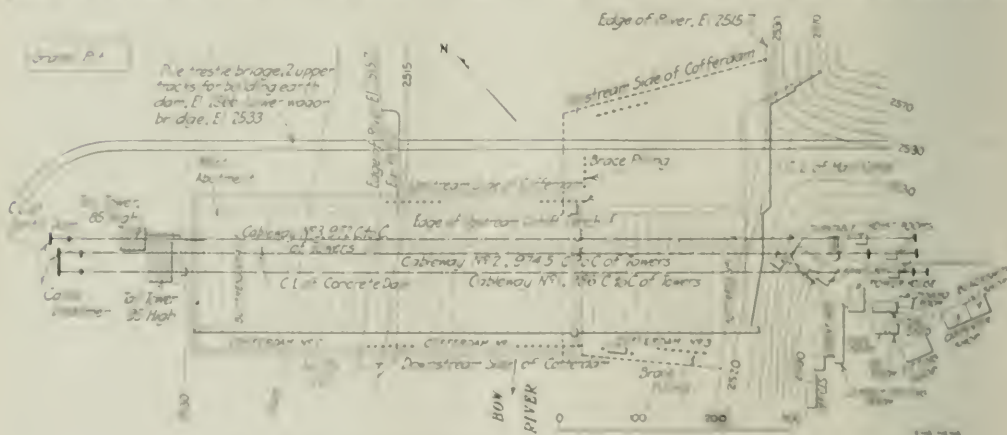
GENERAL LAYOUT OF CONSTRUCTION PLANT FOR BASSANO DAM
